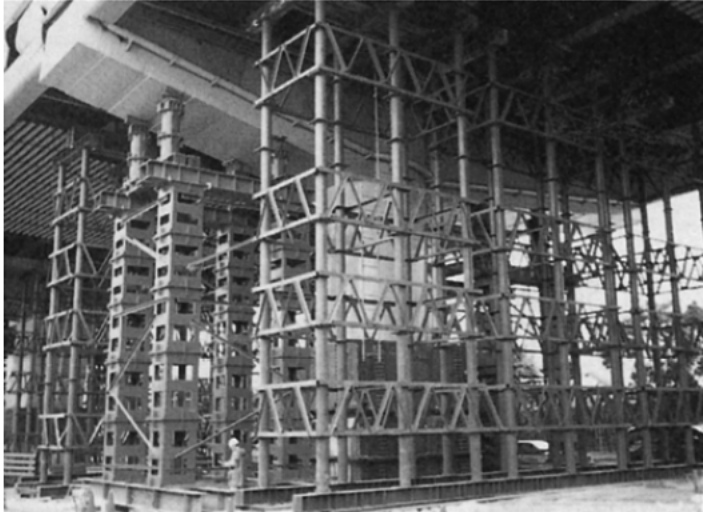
Temporary Supports for Girders and Cap Beams
